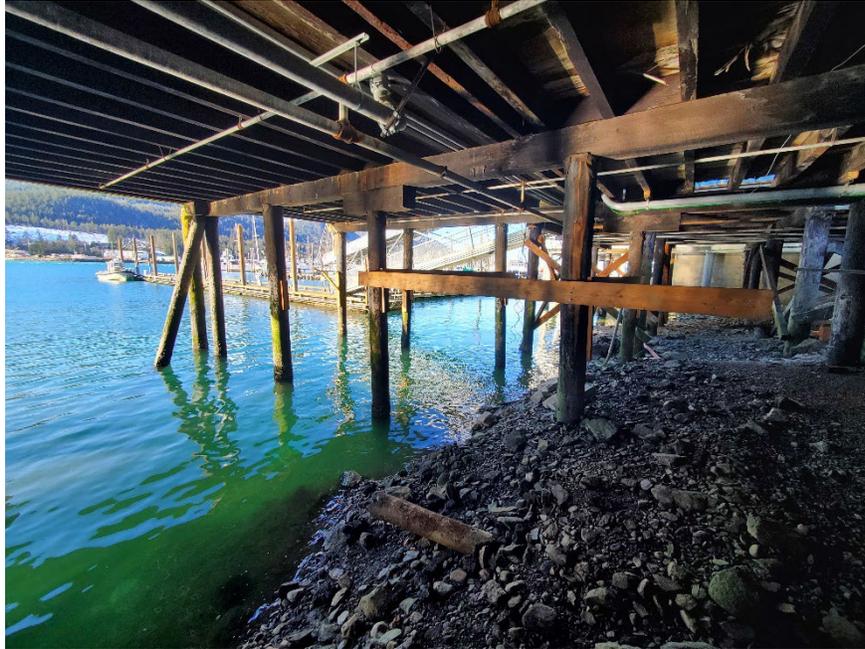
View under building looking out towards water in a southwesterly direction. 20230221_120209.
